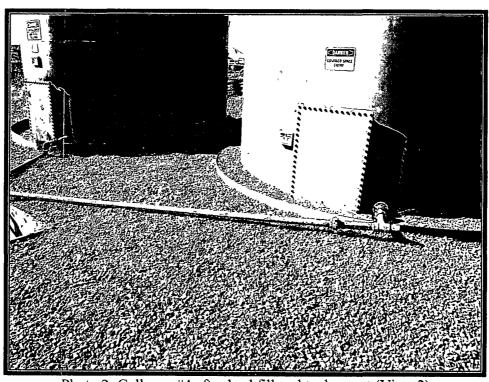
Gallegos #4 after backfill and tank re-set (View 2)
